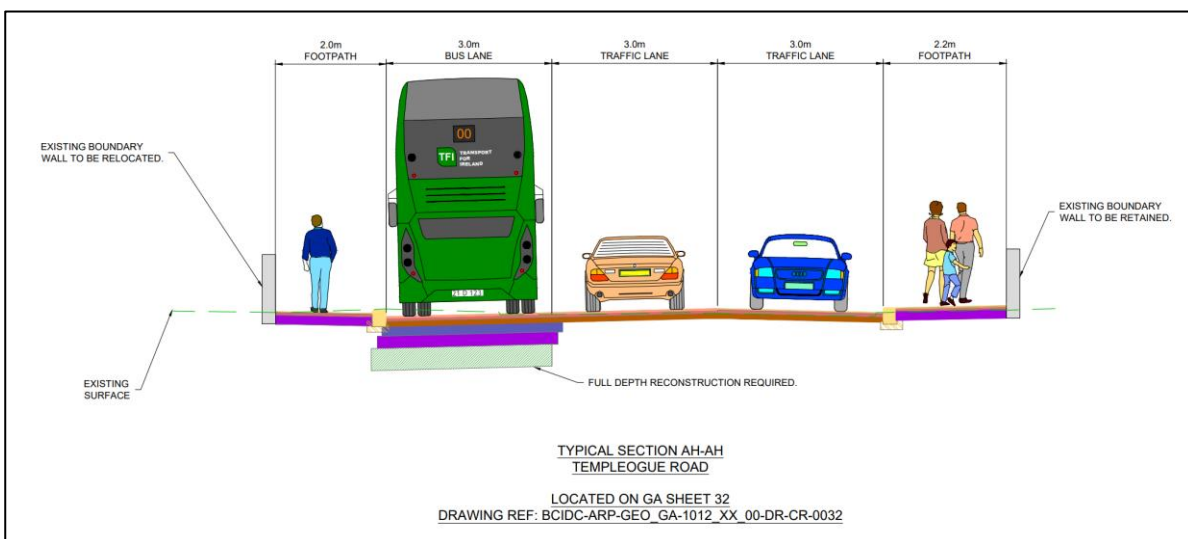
Typical Cross-Section adjacent to 14 Fortrose Park
